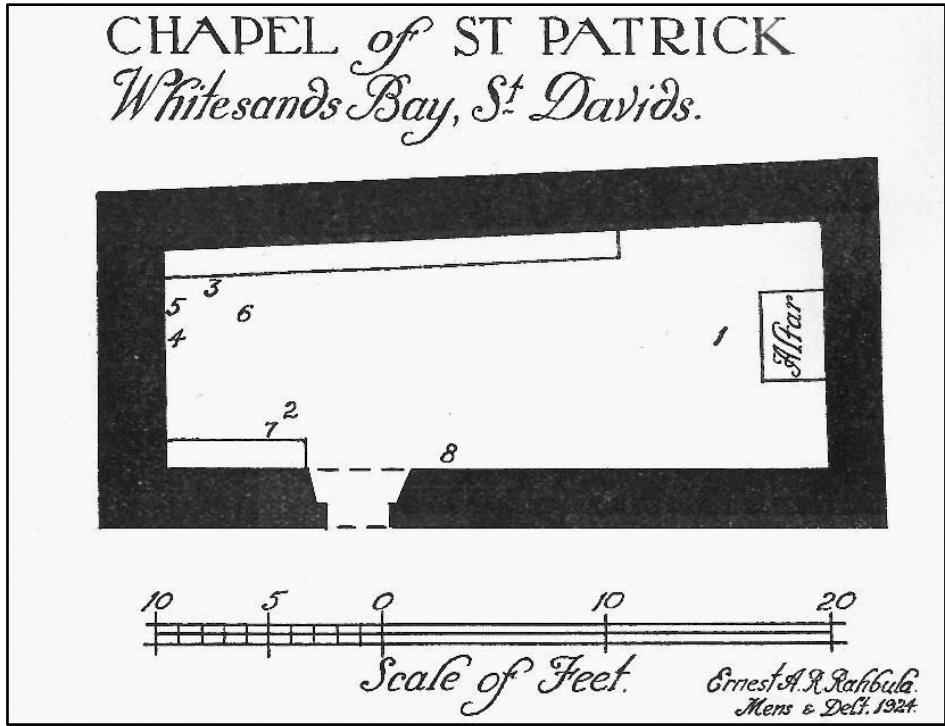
Excavated plan of St Patrick's Chapel (reproduced from Badger and Green, "St Patrick")
